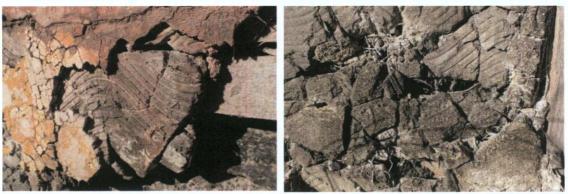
Later keyed plaster with netting support and gypsum top coat laid over the wall.
